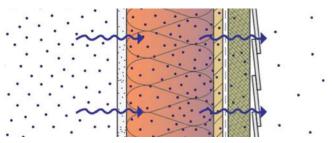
Vertical Section through Insulated 2x6 Wall with Vapour Permeable Exterior Rigid Insulation
